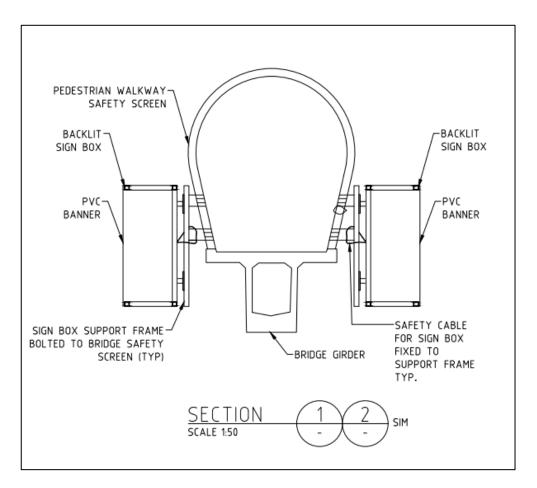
| Cross section of the structures (Source: Revised architectural plans 01/11/24)
